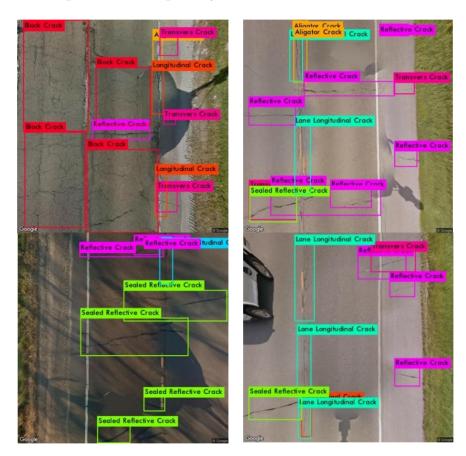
YOLOv2 used in detecting pavement distresses. This is lifted from Majidifard et al. (2020).
